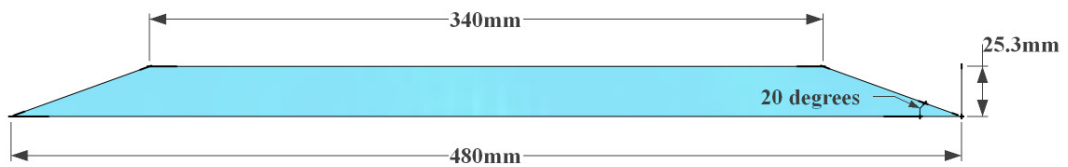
Longitudinal section of GFRP stiffener used in specimen B2
